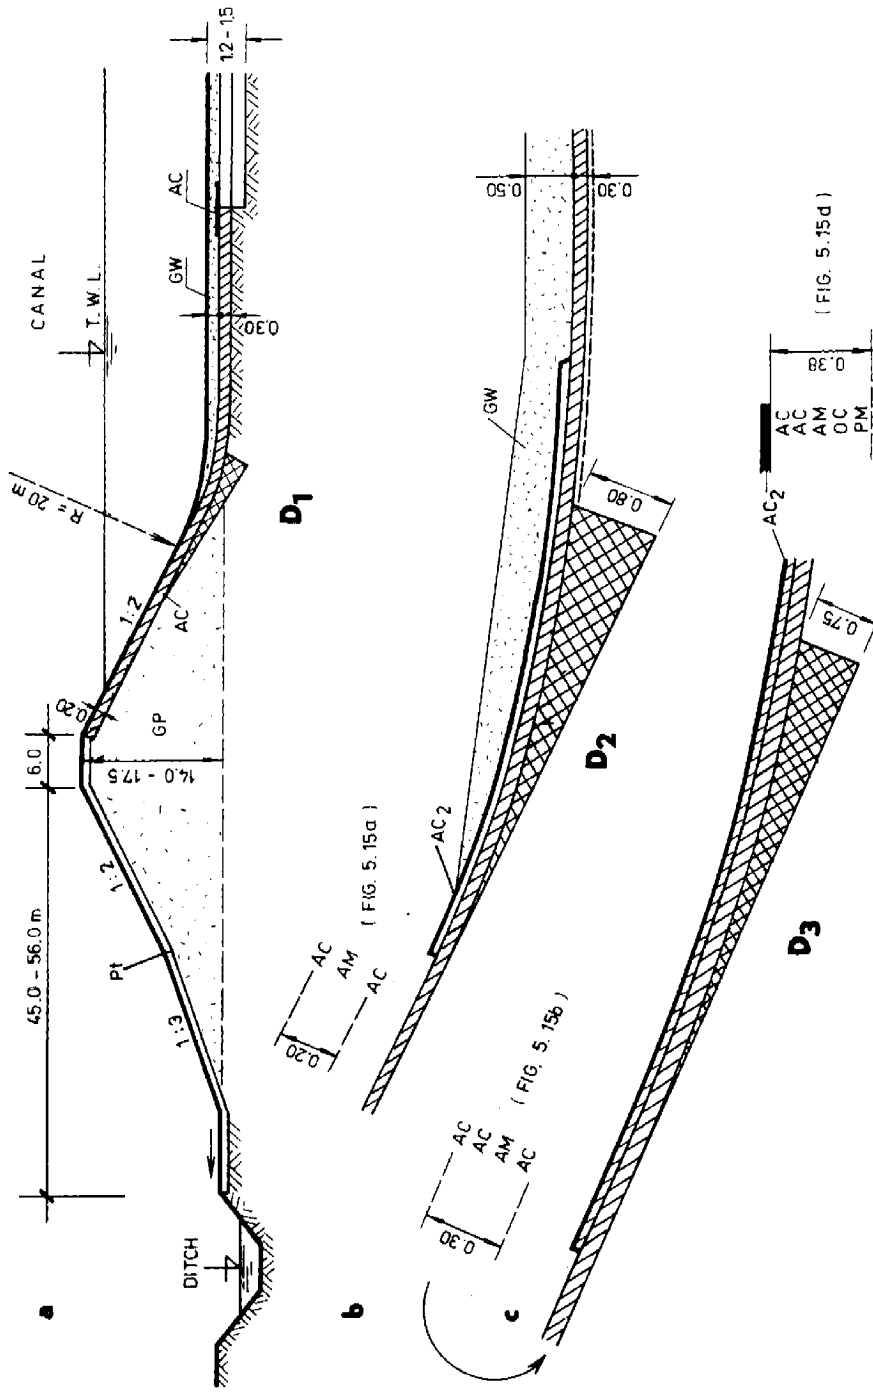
Asphalt-concrete apron and its protection. a — arrangement in cross-section, b — details; D₁, D₂, D₃ — protections for sleading and for anchor lanch by a vessel (Kratochvil 1974a).
